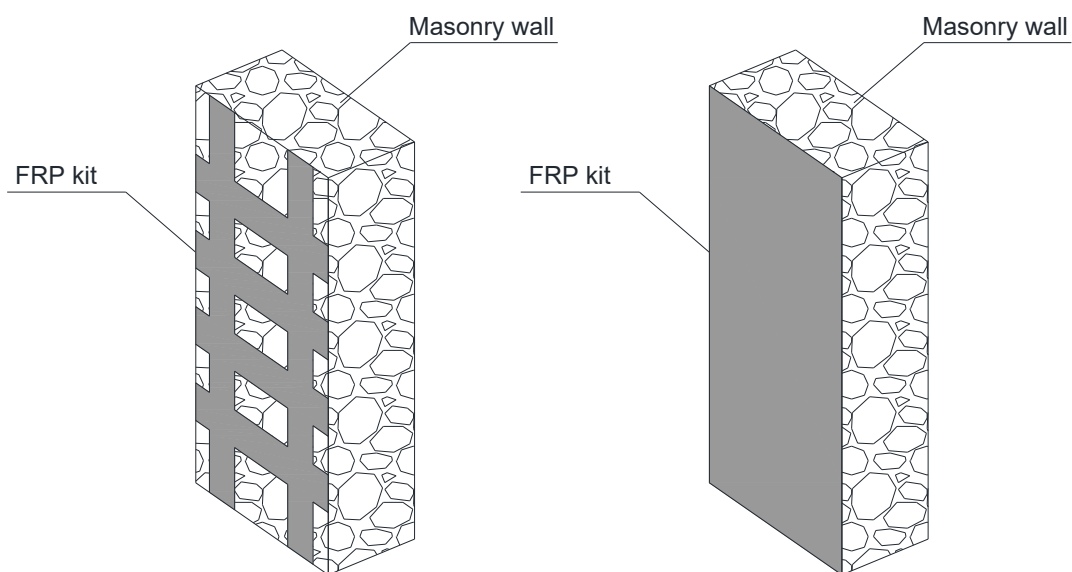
Example of strengthening schemes for masonry walls (or load-bearing concrete walls).
